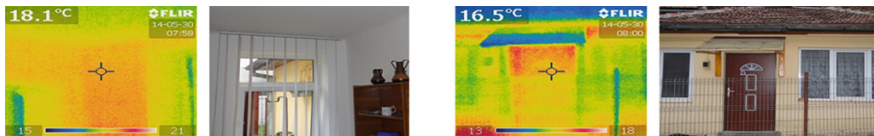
Checking the joints insulation at walls/roof and entrance door at H1 [6]
